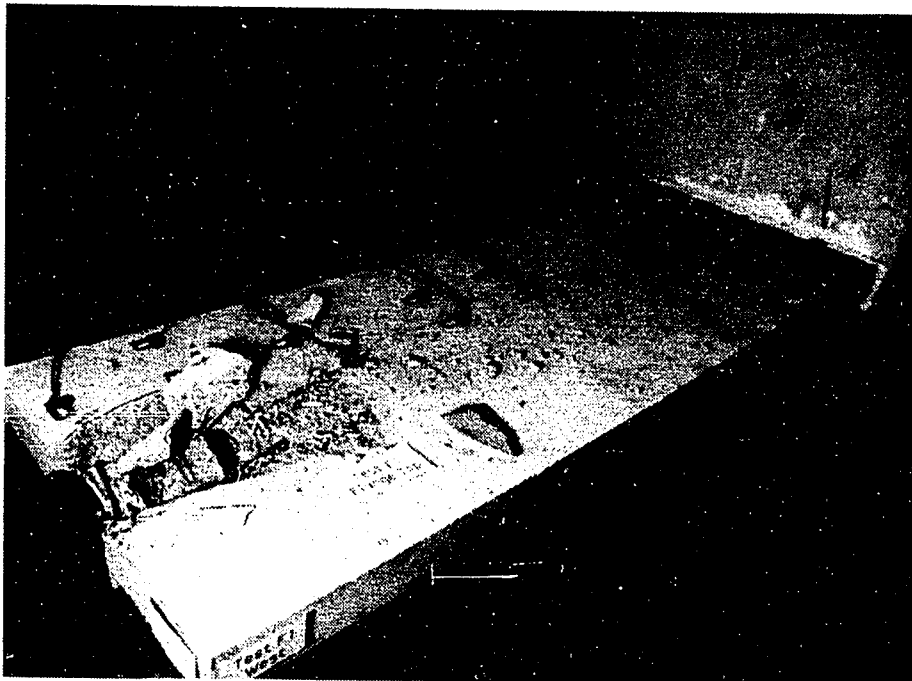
Top of Flange after Specimen Failure, Specimen F1
